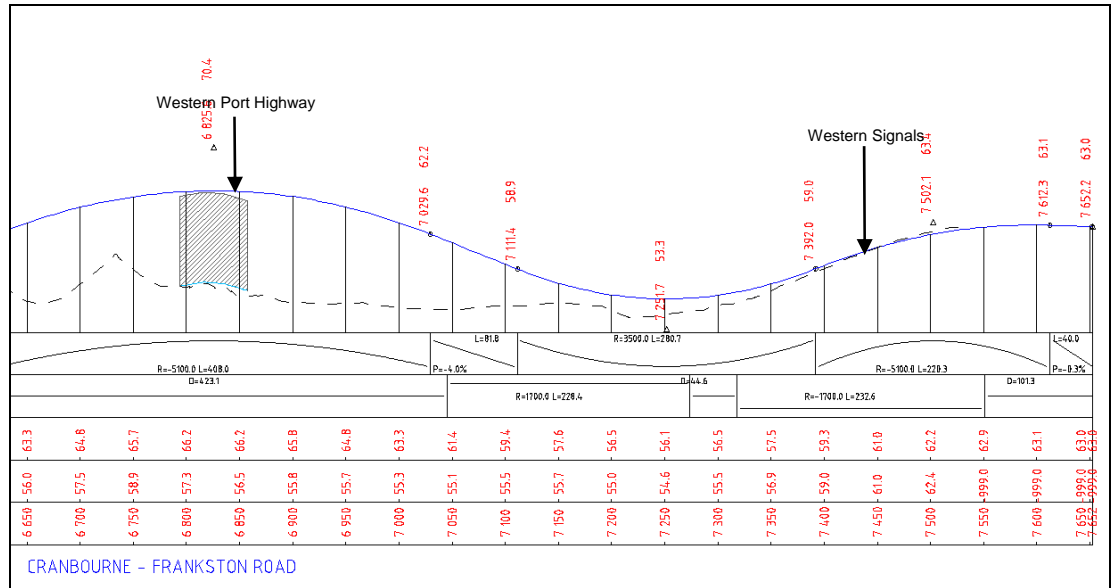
Cranbourne-Frankston Road Longitudinal Section
